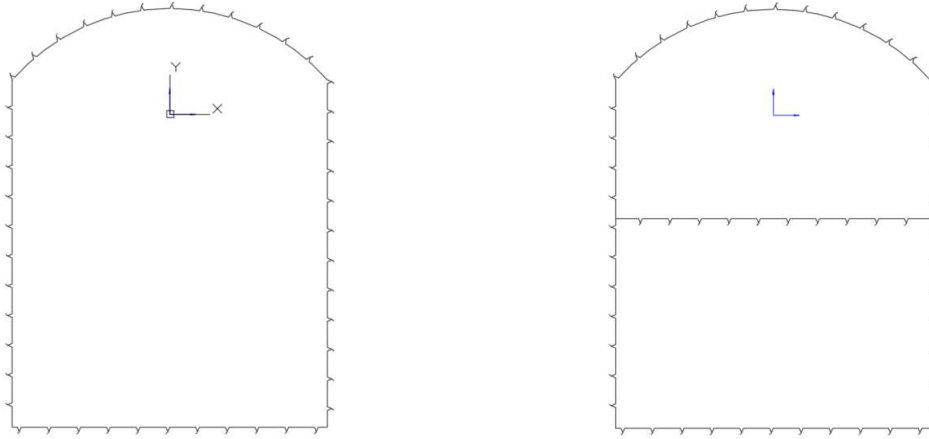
Tunnel type 1 -Full face or phase 1 and 2 excavation
